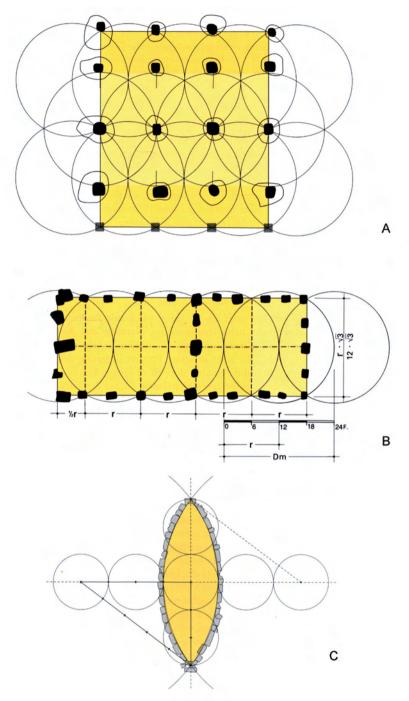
Manching, Germany, method of planning: A – gate structure elements;
